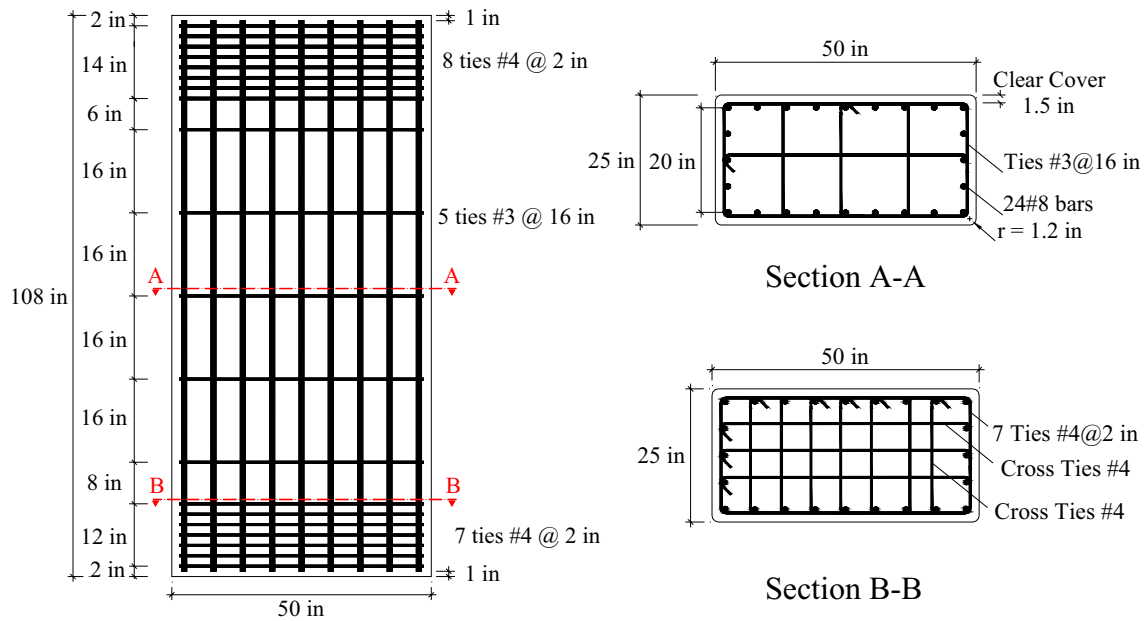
Schematic of Reinforcement Layout; Series H Specimens
